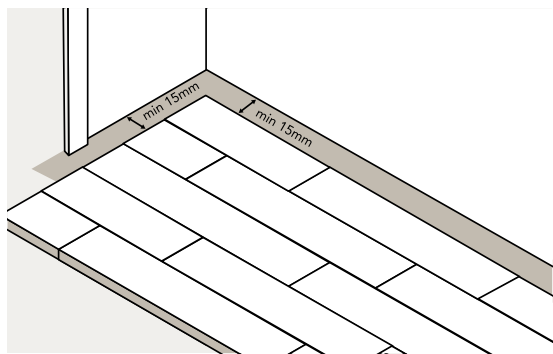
Leave a minimum of 15mm around the perimeter and all architectural details and obstructions
